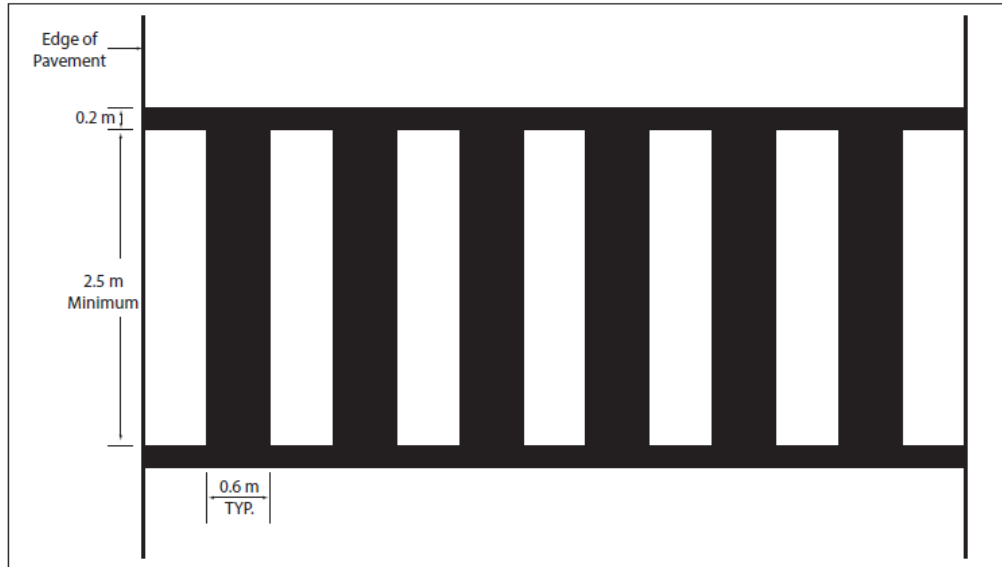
Pavement Markings for a Typical Ladder Crosswalk
